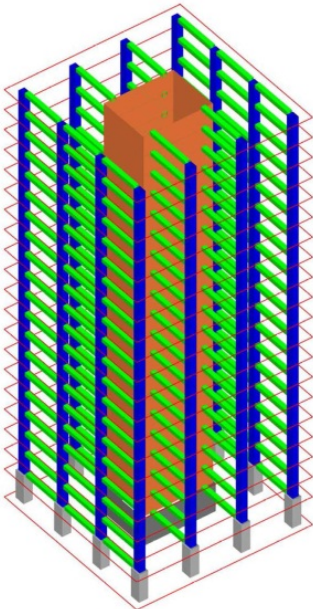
Isometric of proposed timber structural system for twenty storey building with a rectangular core of integrated CLT panels, glulam columns and floor beams
